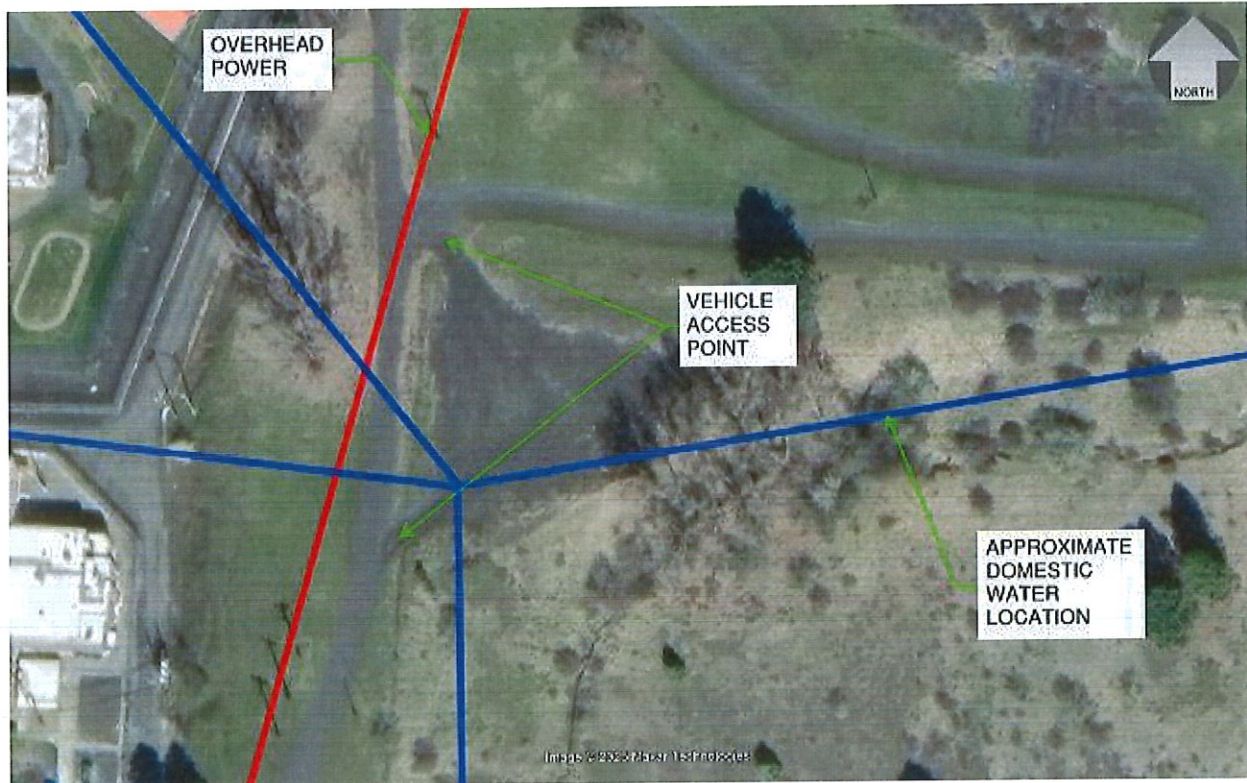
SITE 4 ACCESS AND UTILITY LOCATIONS
